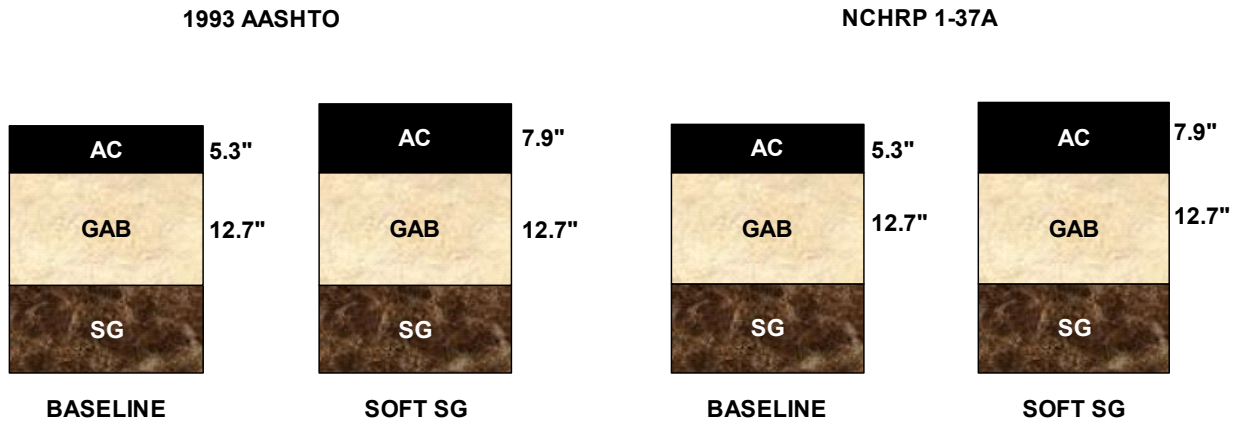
Summary of flexible pavement sections: soft subgrade scenario.
